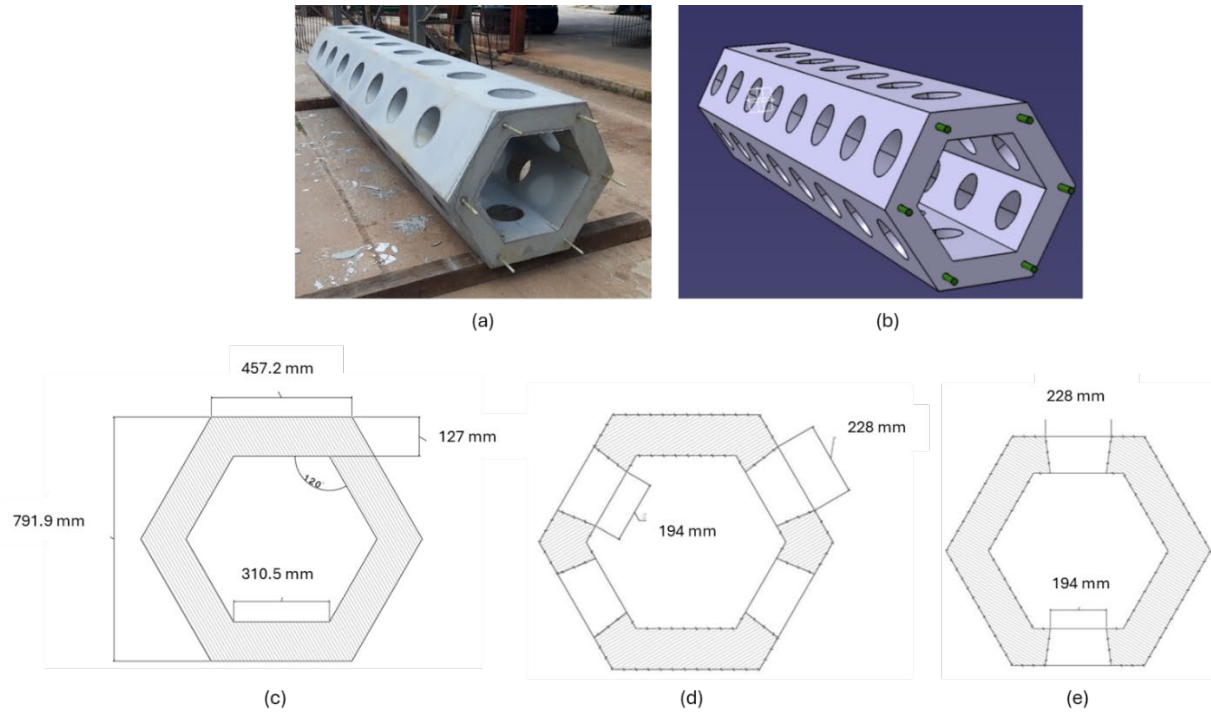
Geometry of PC SEAHIVE® unit: (a) PC SEAHIVE® at the test site; (b) PC SEAHIVE® modeled in Abaqus software; (c) solid cross-sectional view with dimensions; (d) cross-sectional view with four holes; (e) cross-sectional view with two holes
